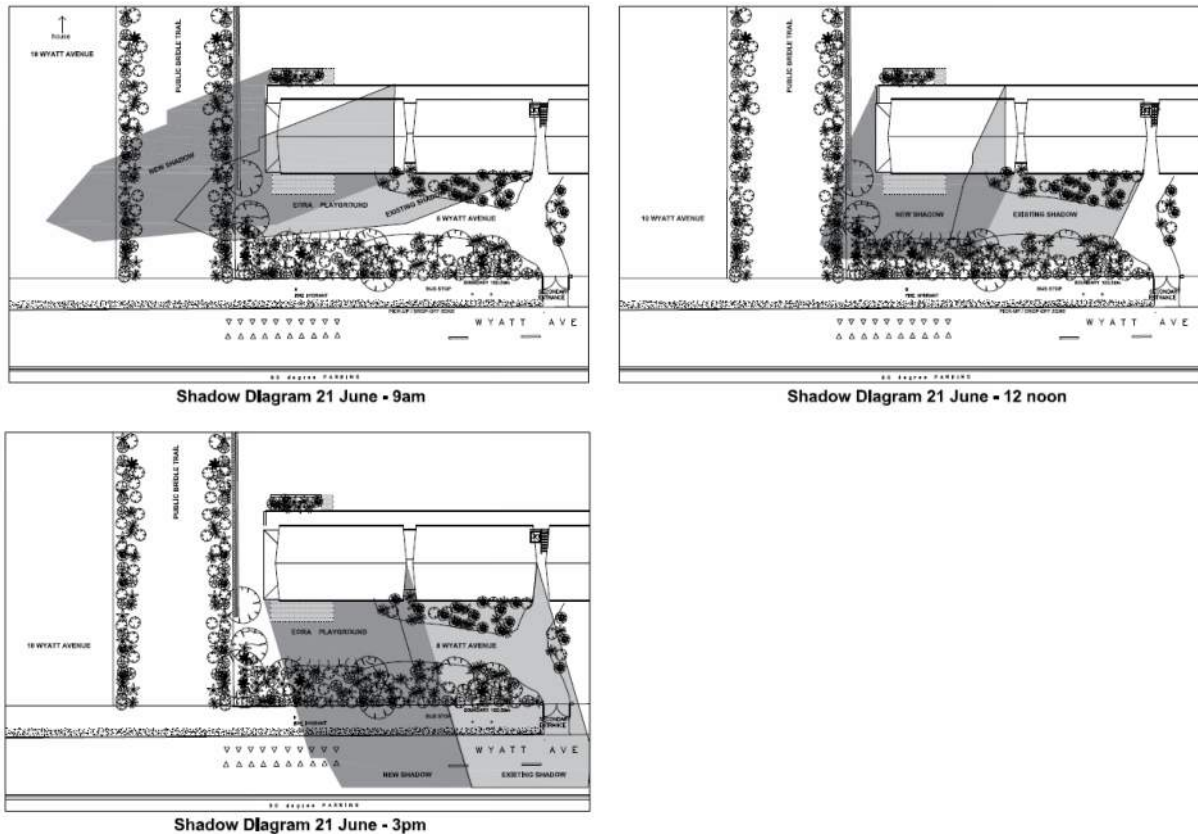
Proposed Shadows Diagrams with Amended Built Form (Source: Templum Design Architects)
